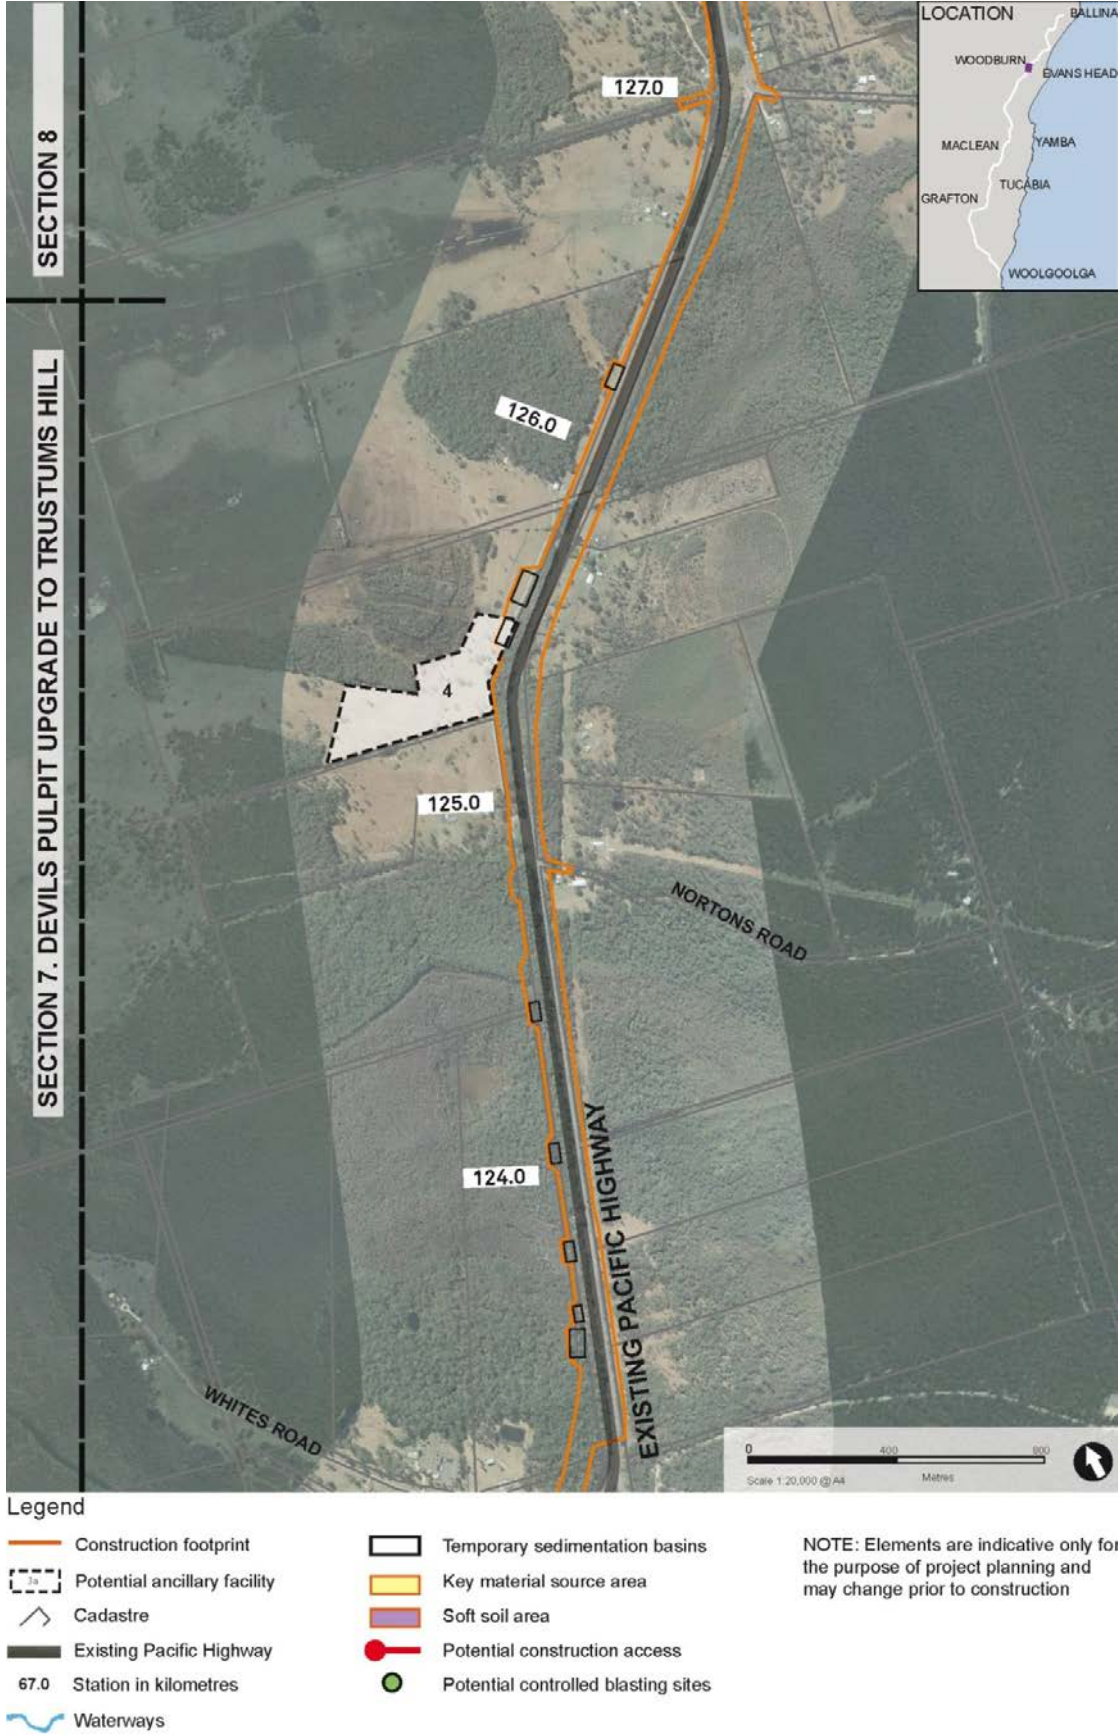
Extent of construction and construction features Section 7 (Station 123.2 to 127.2)
